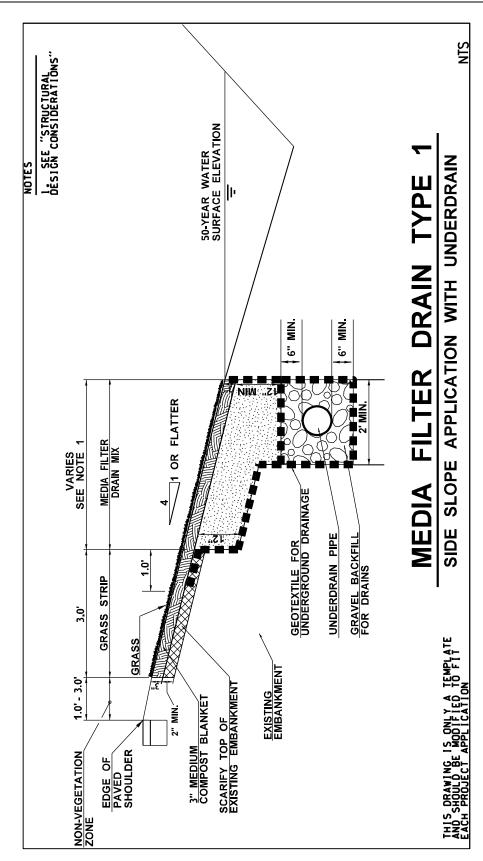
Media filter drain Type 1: Side slope application with underdrain.
